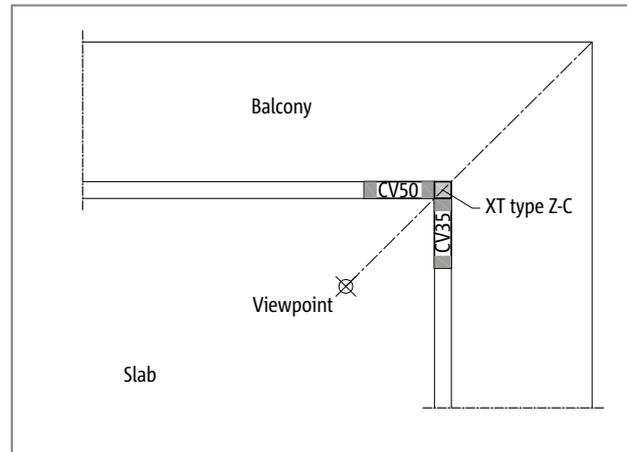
Schöck Isokorb® XT type C: Concrete cover selectable: Here CV50 left from viewpoint, concrete cover CV35 right from viewpoint
